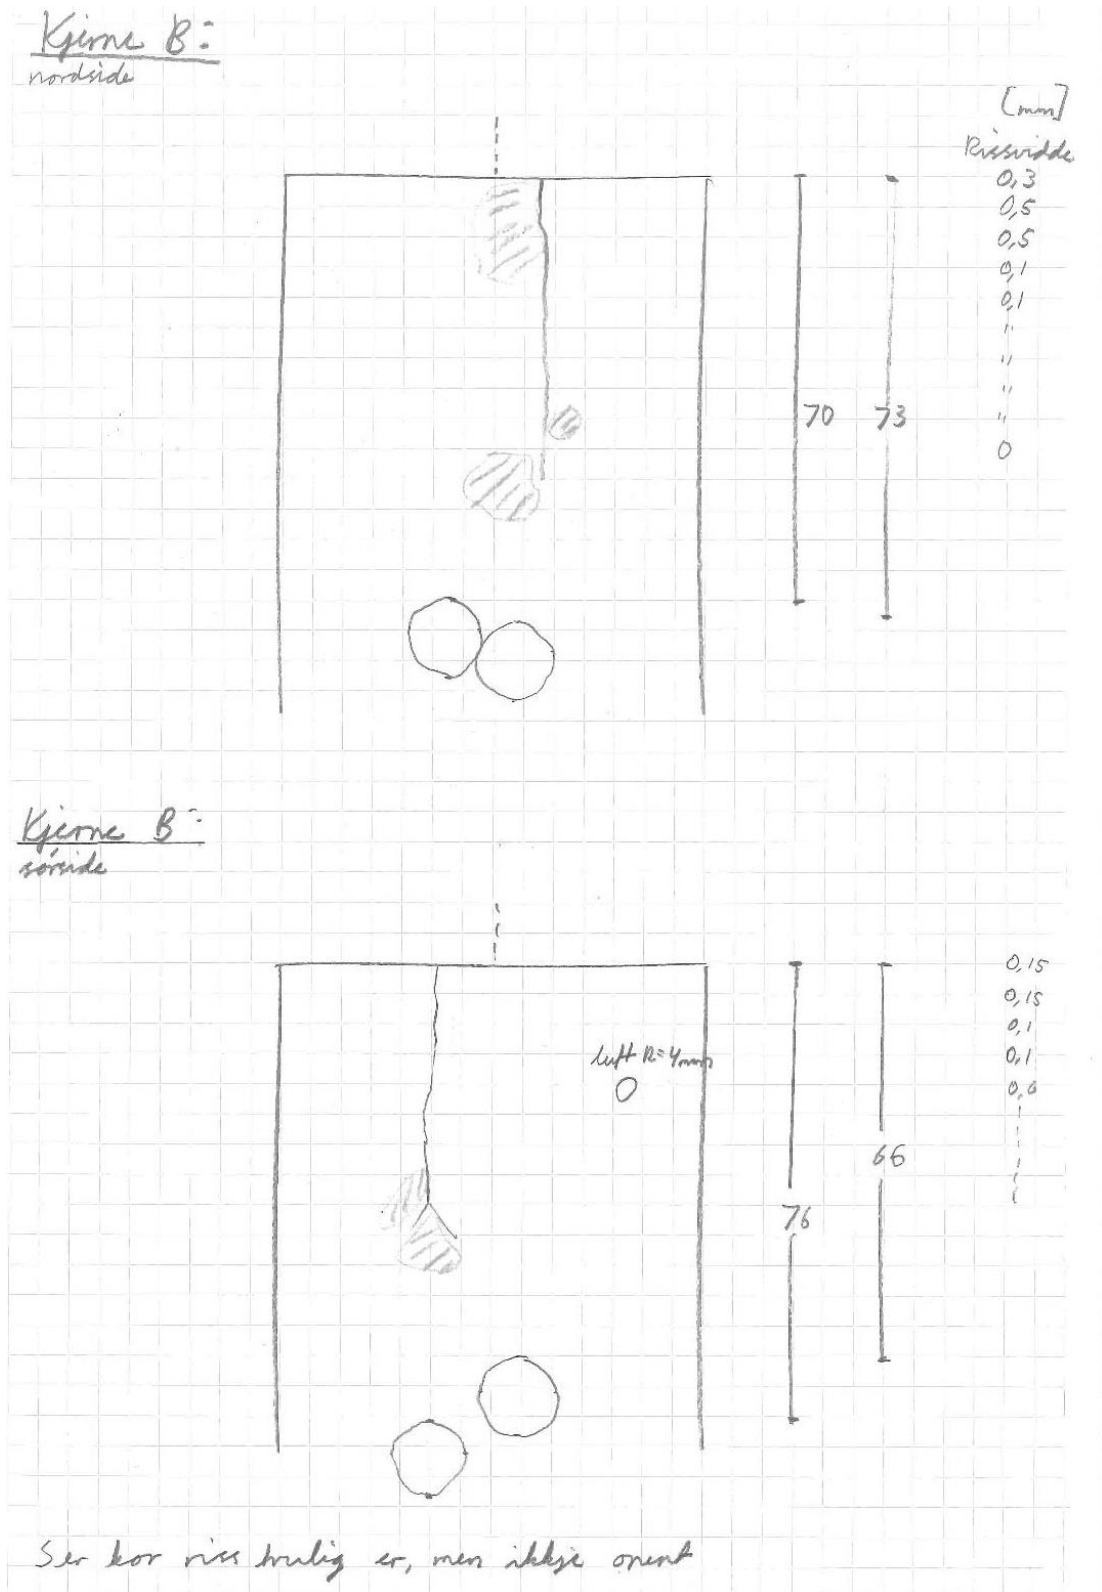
Drawing of core B with point of interest and detailed crack width.
